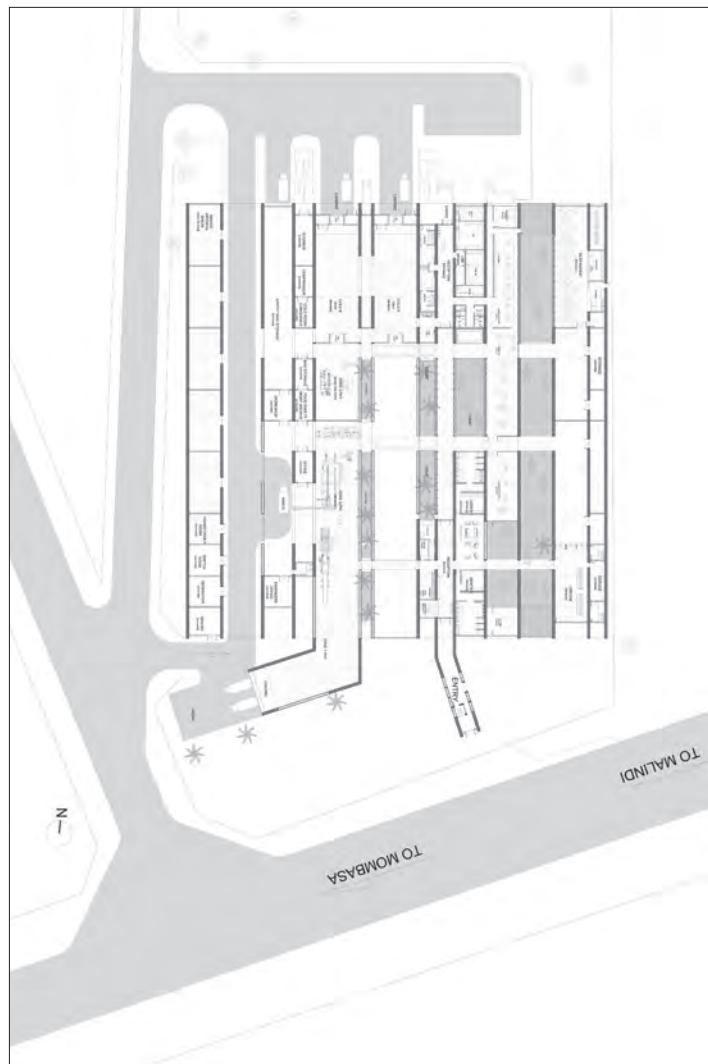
Allfruits EPZ Ltd Plant, floor plan.
